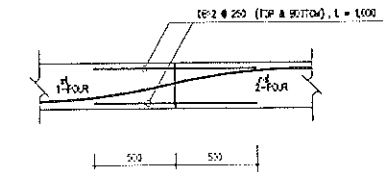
REINFORCEMENT FOR SLAB CONNECTED TO LIFT CORE/SHEAR WALL
